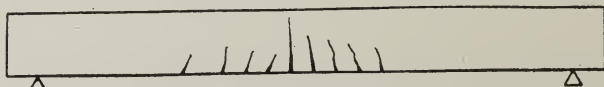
Ideal Failure of Reinforced Concrete Beam by Steel Tension.
